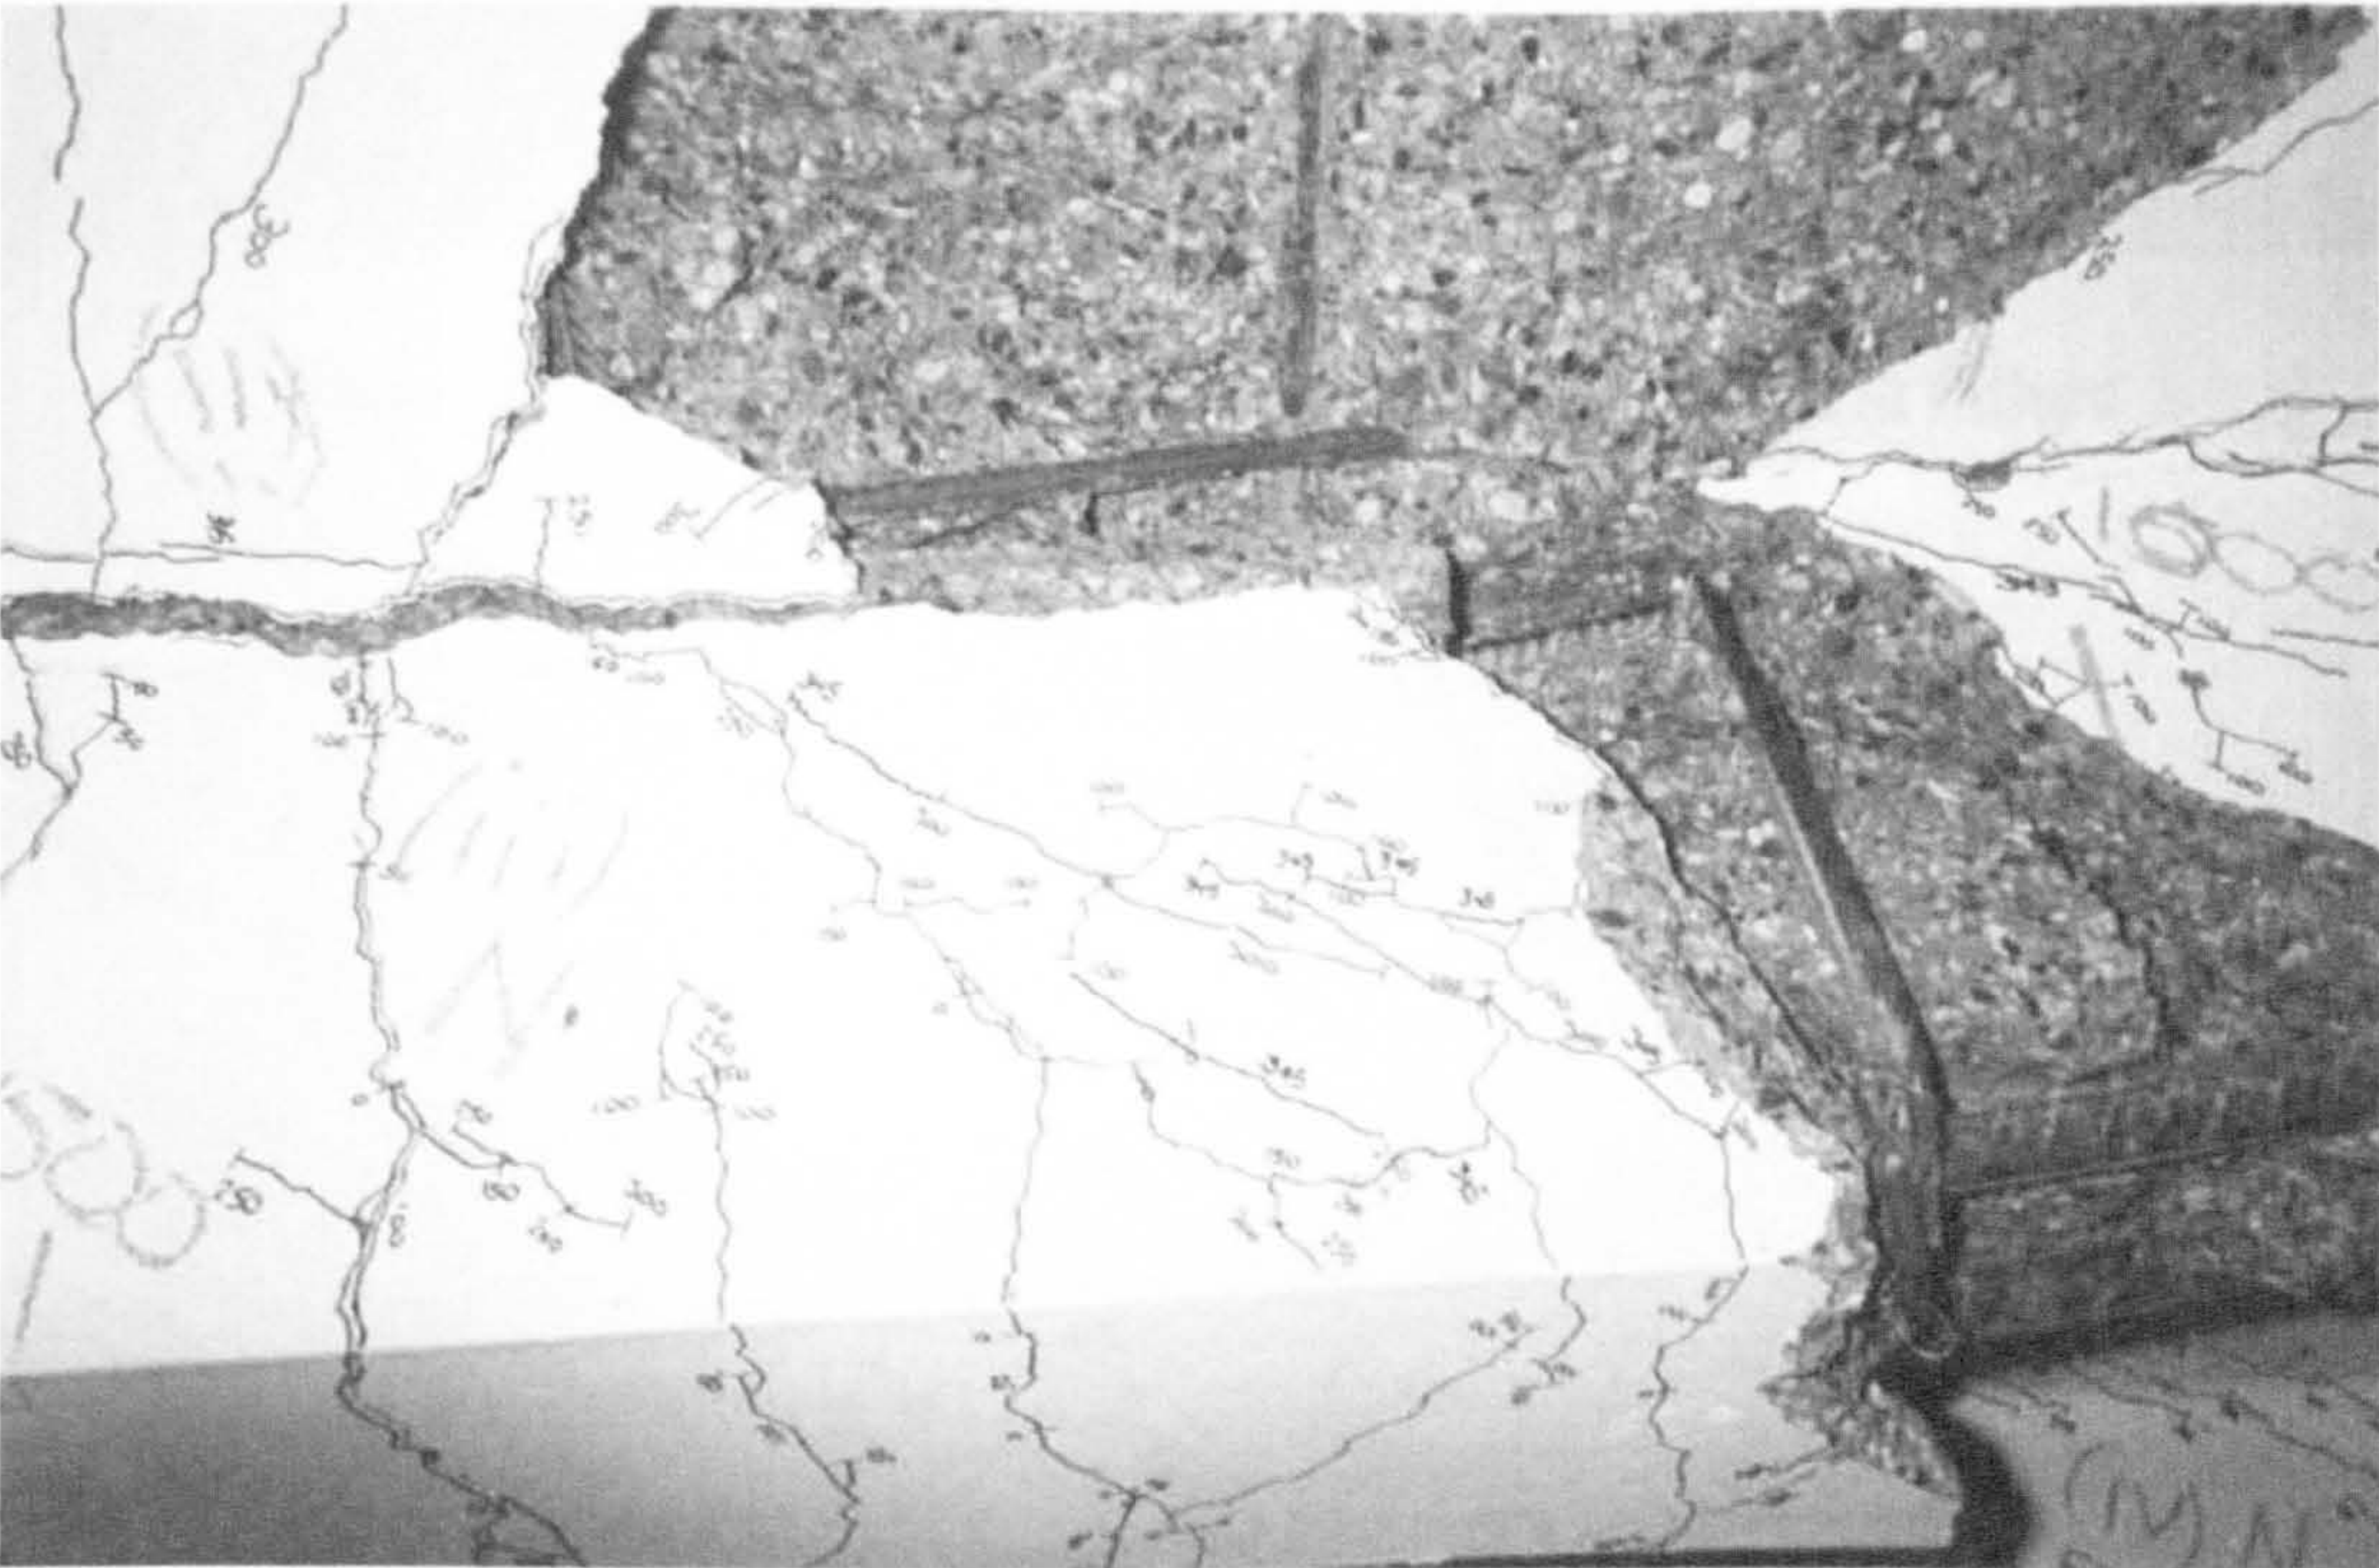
Deck 2 shear failure of beam iii and separation of beam from slab
